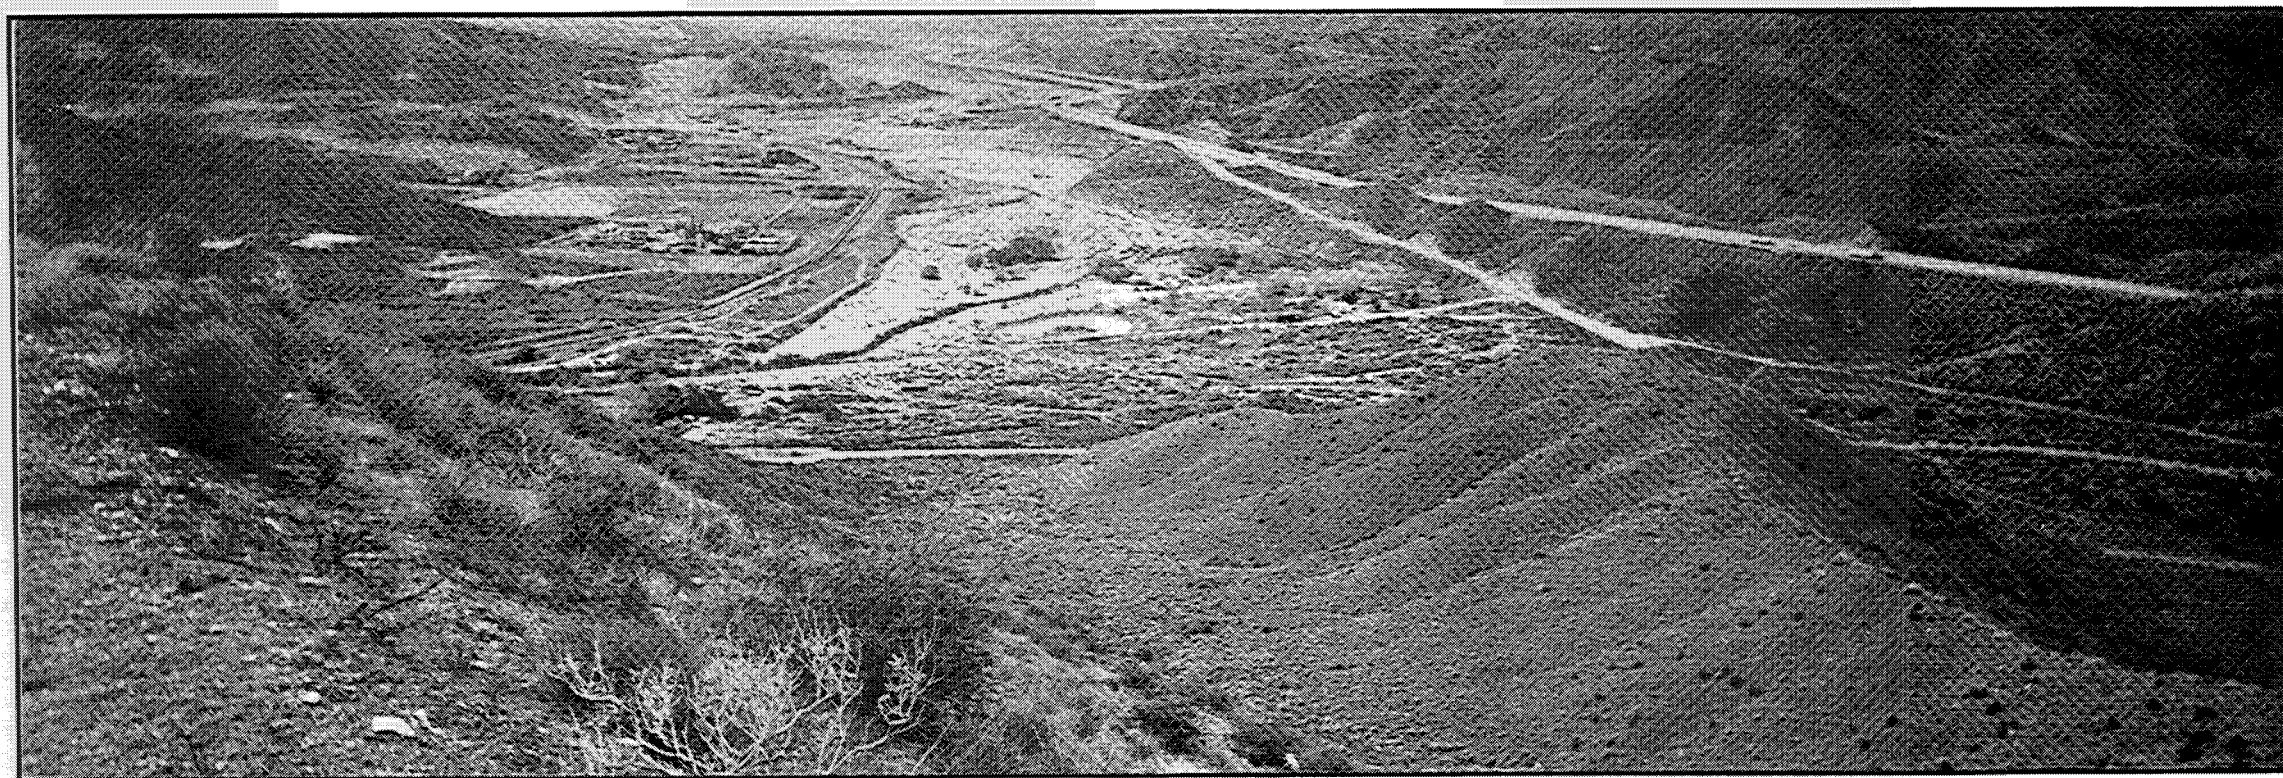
Western portion of site, looking west. Soledad Canyon Road and Santa Clara Riverbed (offsite) in middle ground and background. Antelope Valley freeway at upper right in photo.
